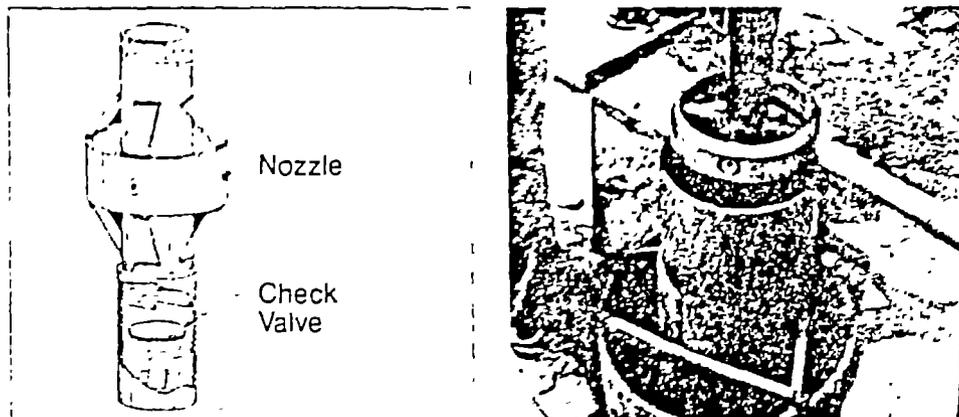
Four-nozzle jetting tool designed for jet development of well screens. The check valve allows the jetting tool to be used for intermittent pumping of the well. A plate bottom is often used in place of the check valve if the tool is not to be used for pumping. To avoid breakage, the pipe base of the tool can be made of heavy-wall pipe if it is to be attached to the bottom of the drill pipe. At right, a jetting tool is being lowered into inner casing that has been centered in the surface casing.
